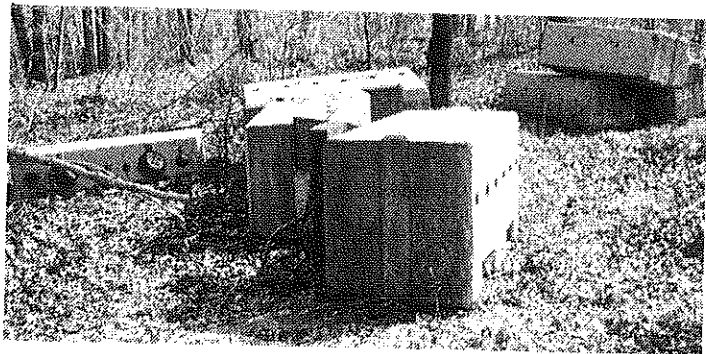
Concrete Blocks north of the Multiple Failure Building
